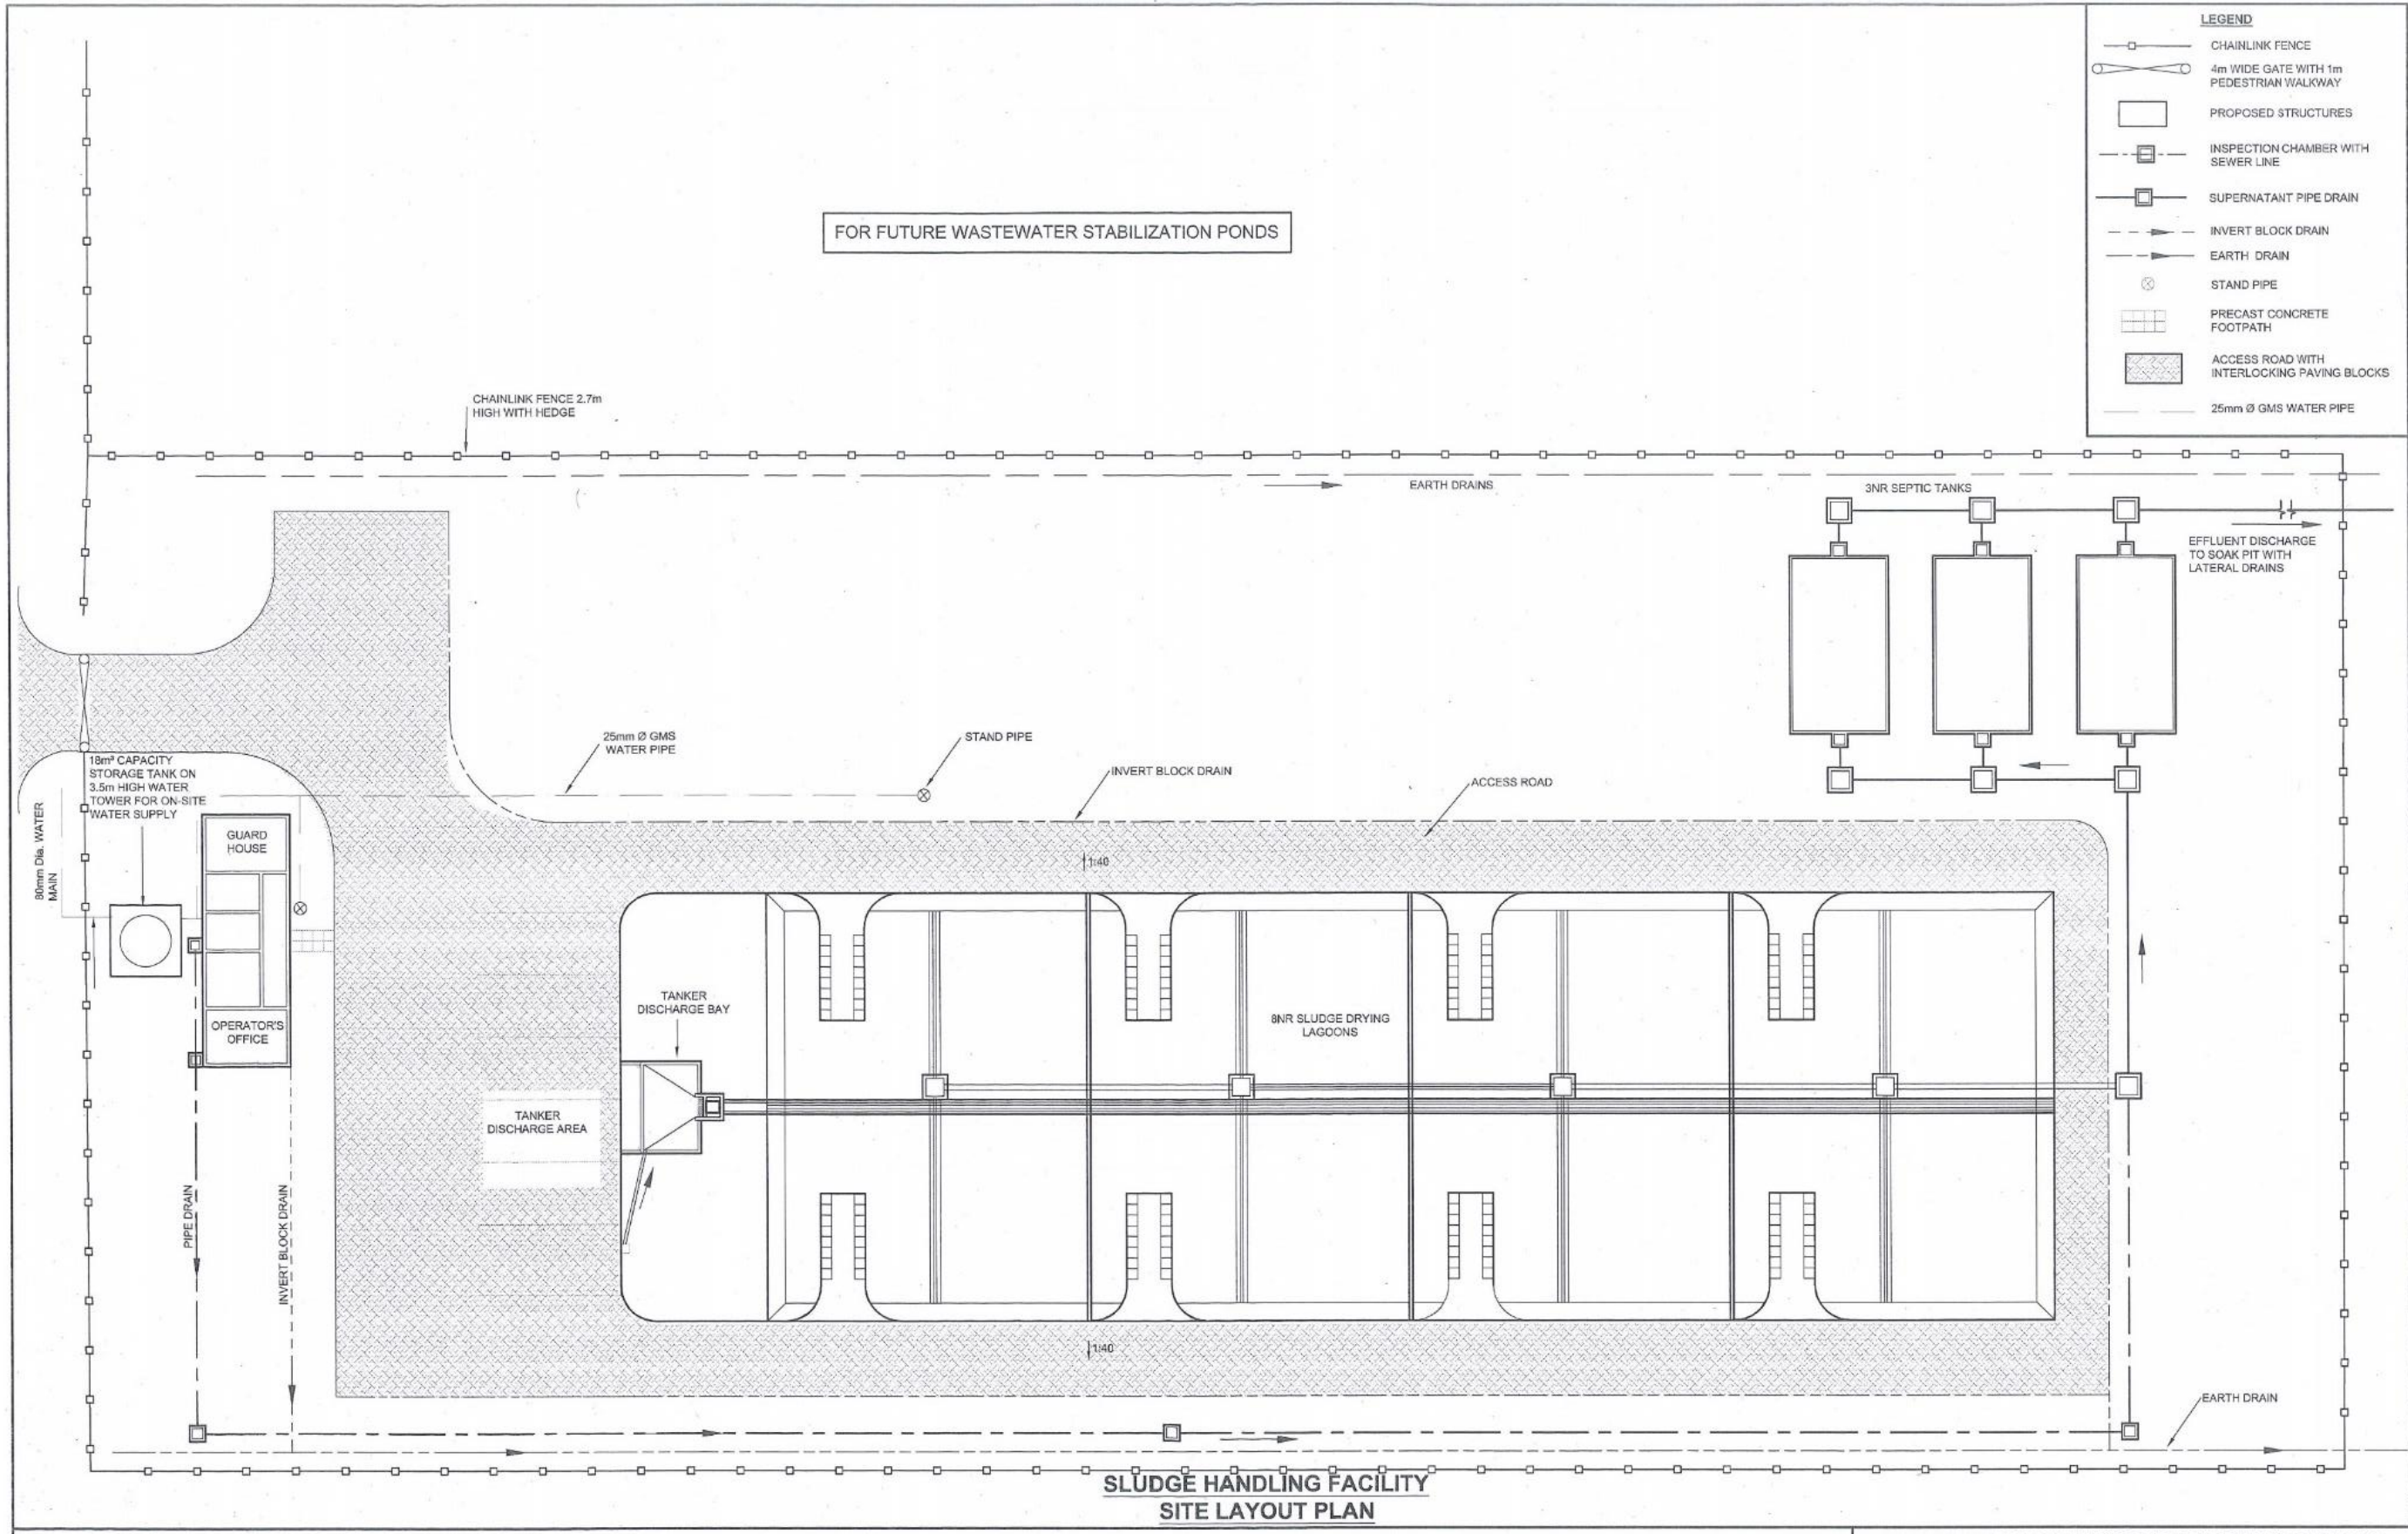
Schematic Layout Plan of the proposed Sludge Handling Facility
